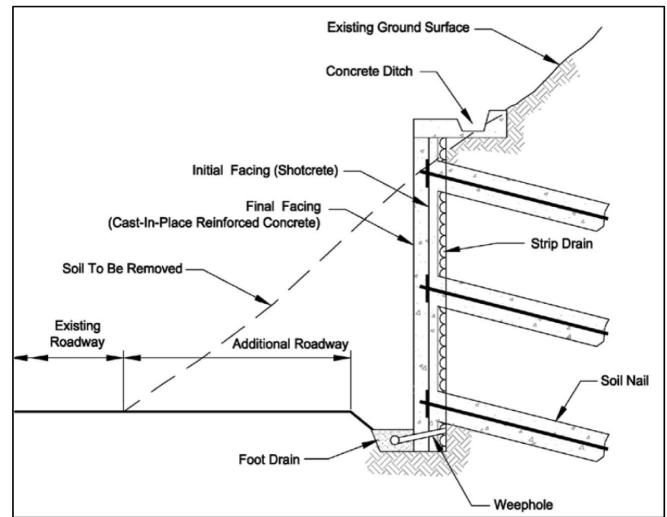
Roadway cut supported with soil nails. Modified after Porterfield *et al.* [25].
